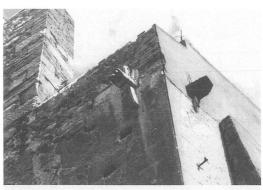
A couple of wooden tie-rod used to repair damaged walls. (Cagliari, Marina, Scalette di Santa Teresa)
